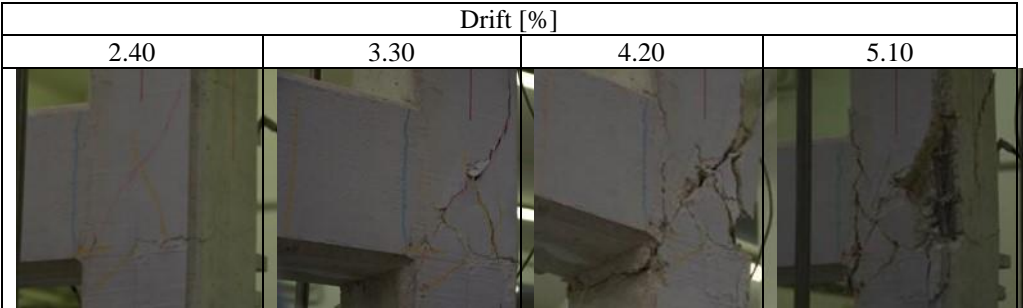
Damage to beam-column joint regions in specimens GB
